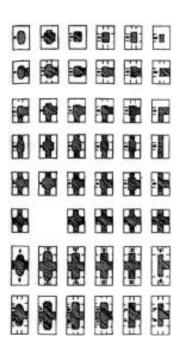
The Matrix of Planimetric Organizations of the 'Turkish house: plan type with a central sofa
